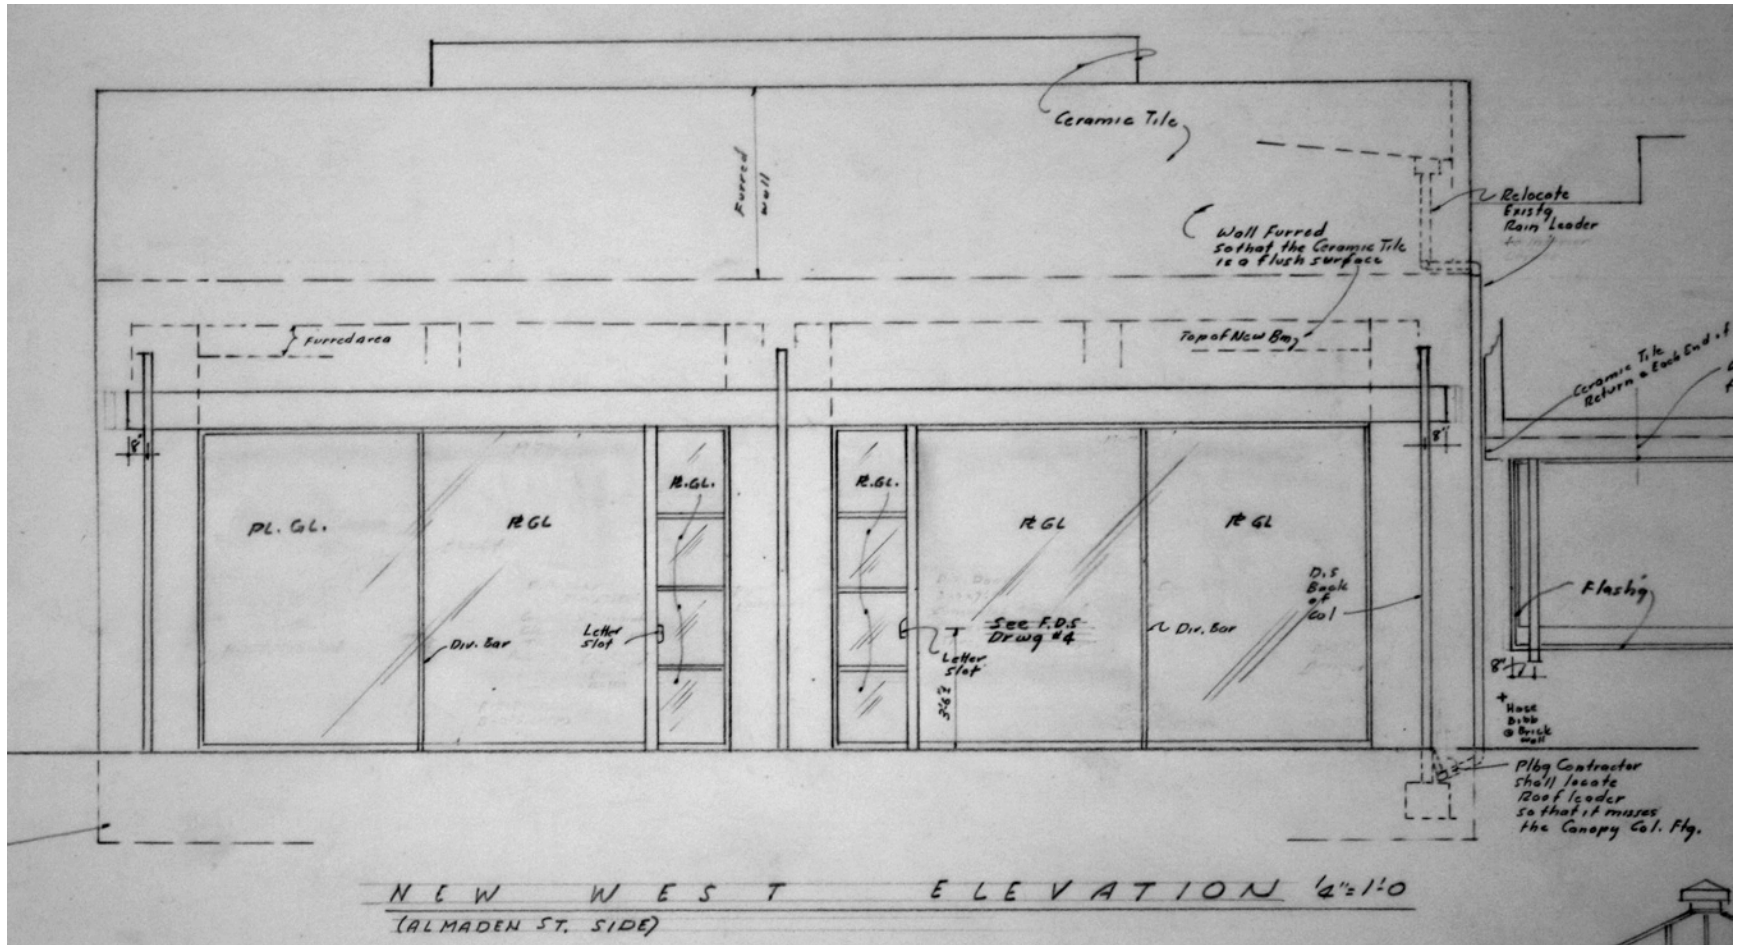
New west elevation, Peter Wuss, architect, December 29, 1960
